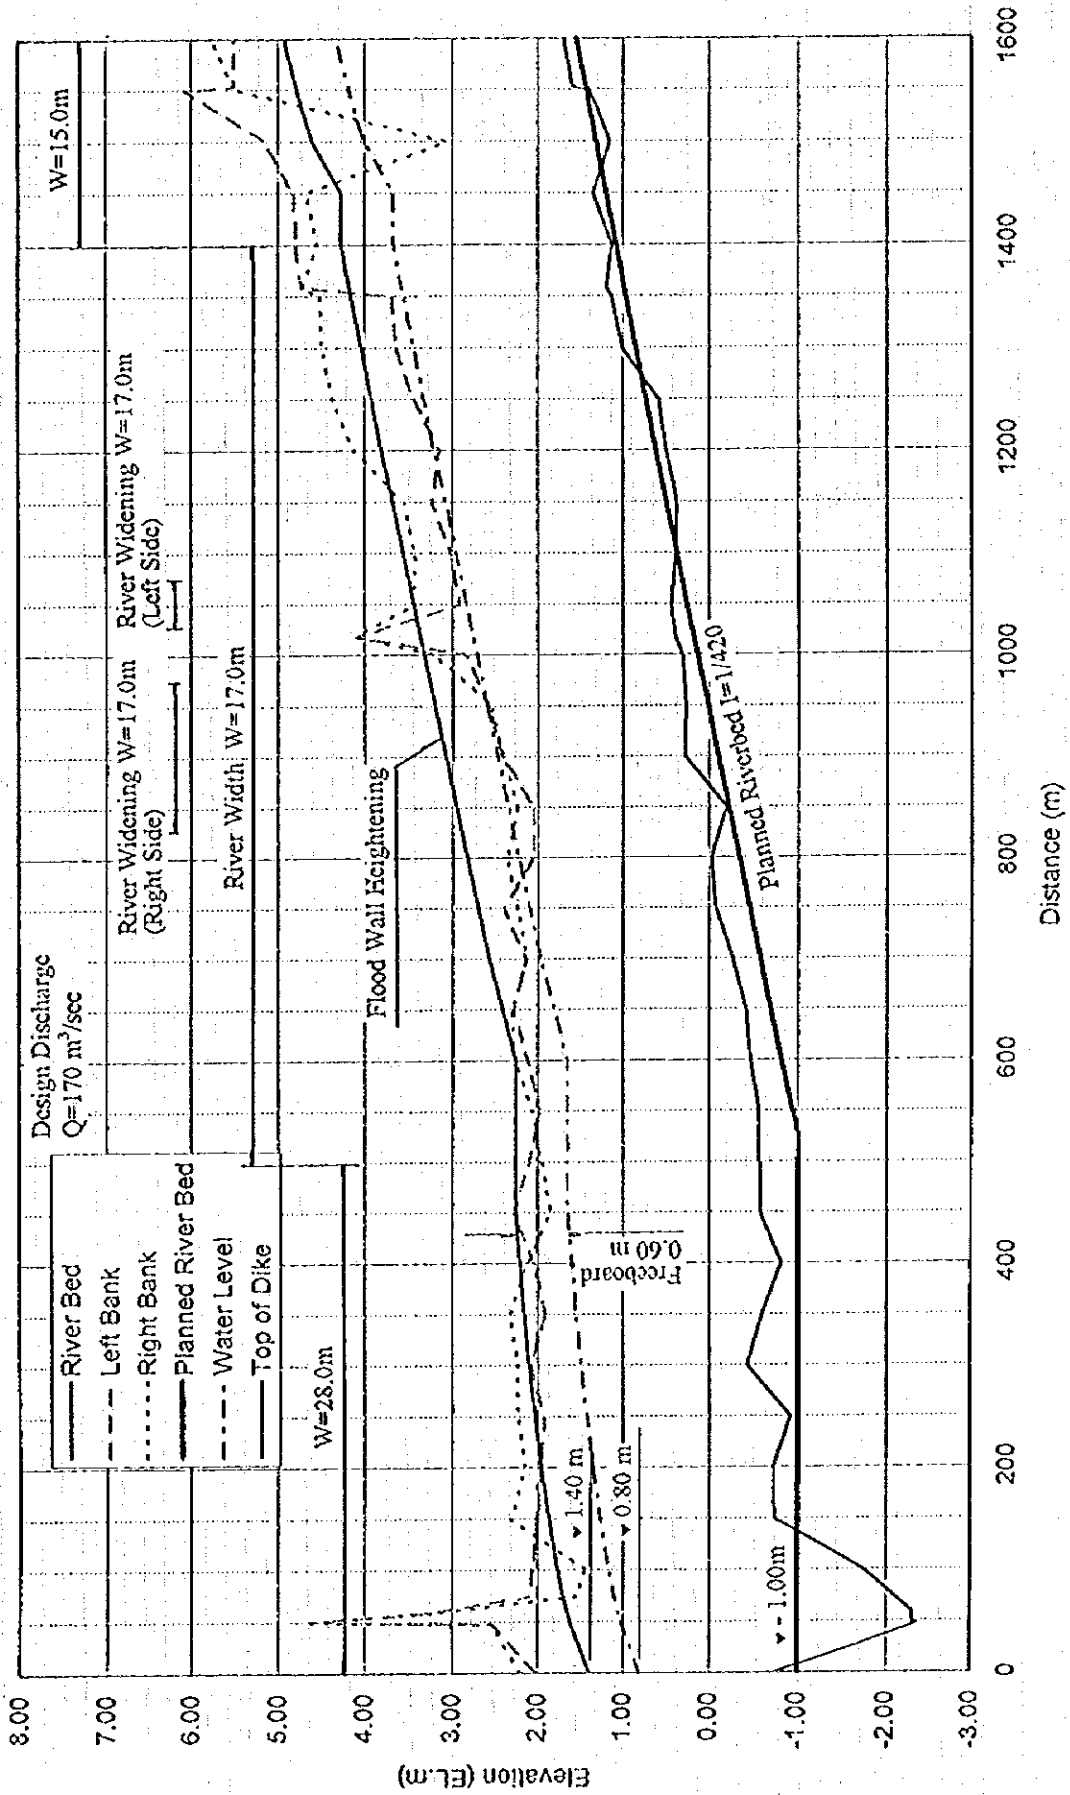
Longitudinal Section of Ruhu River Improvement Plan
